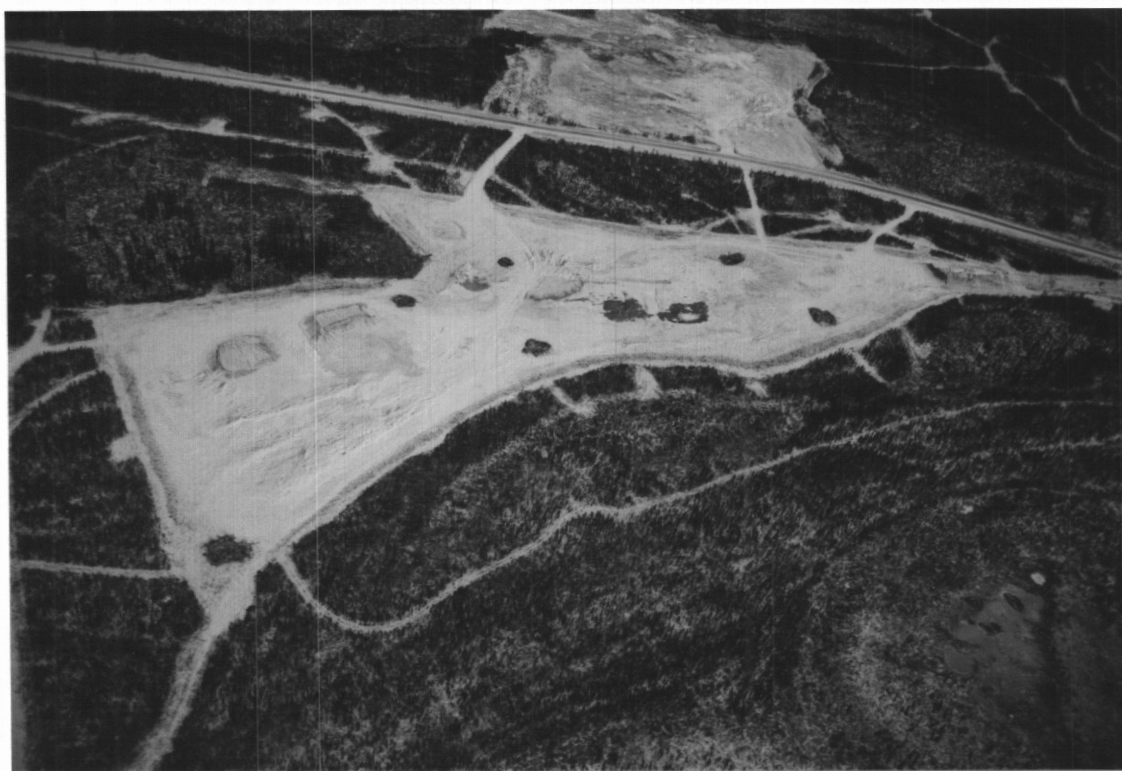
DPW km 64.5 pit in Deposit 5-40. Depleted pit is visible to west of Highway 5, while pit opened up in winter 1986-1987 is in foreground.
